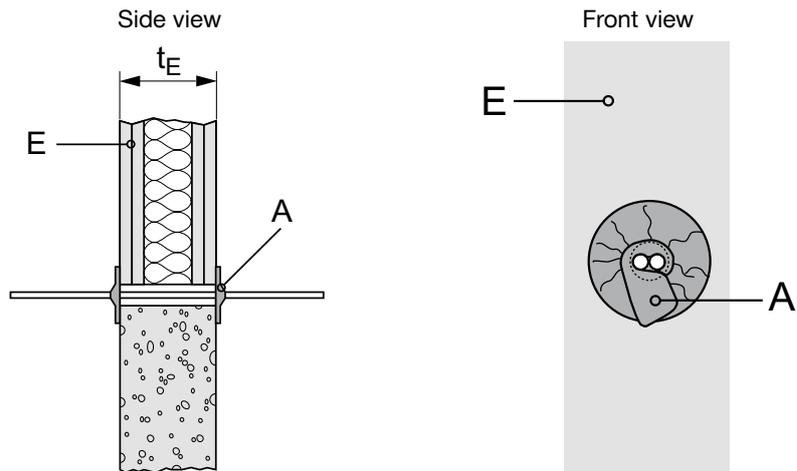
Hilti Firestop Cable Disc CFS-D 25 application
